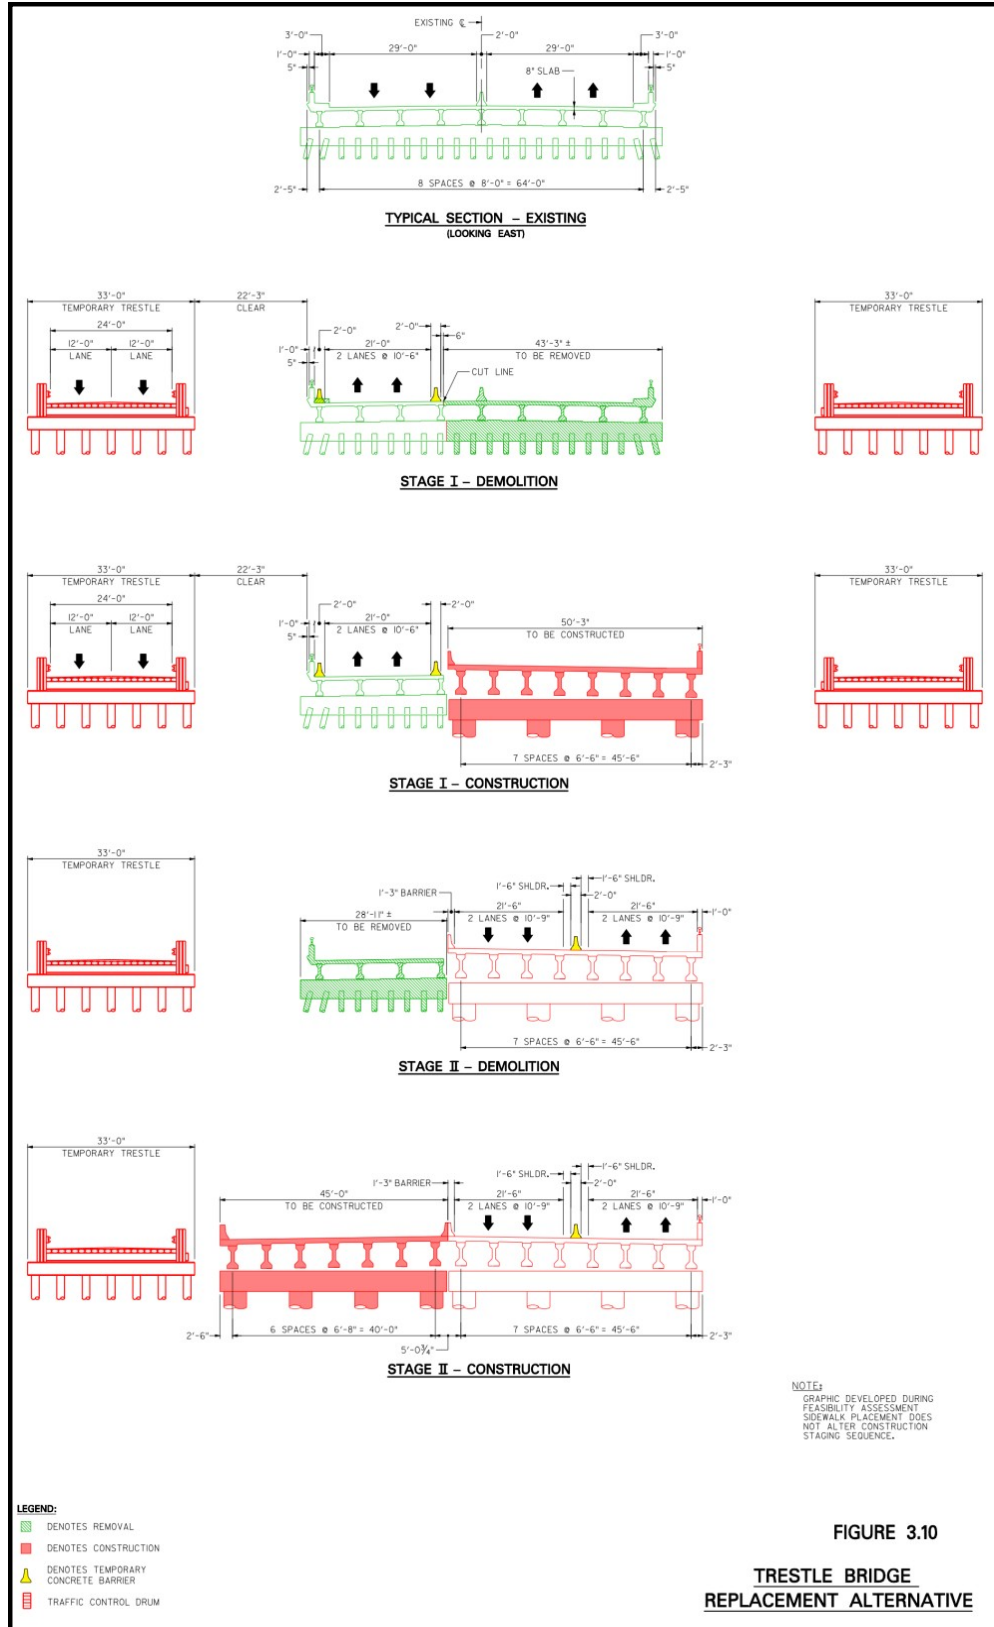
Trestle Bridge Construction Staging (Alternative 2 – Replacement)
